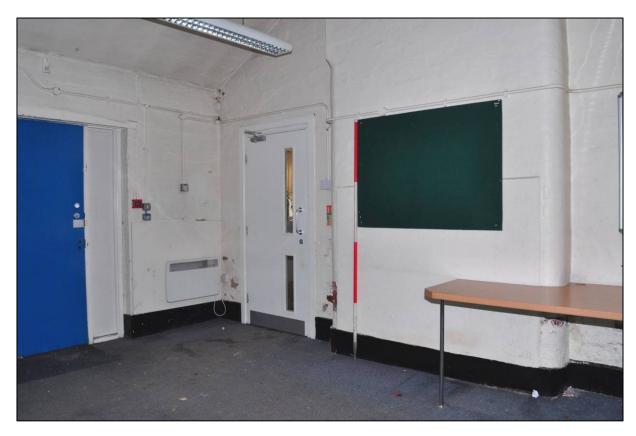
East range, original part, room G18, chimney breast to north wall, looking NW (photo 1/2899).
